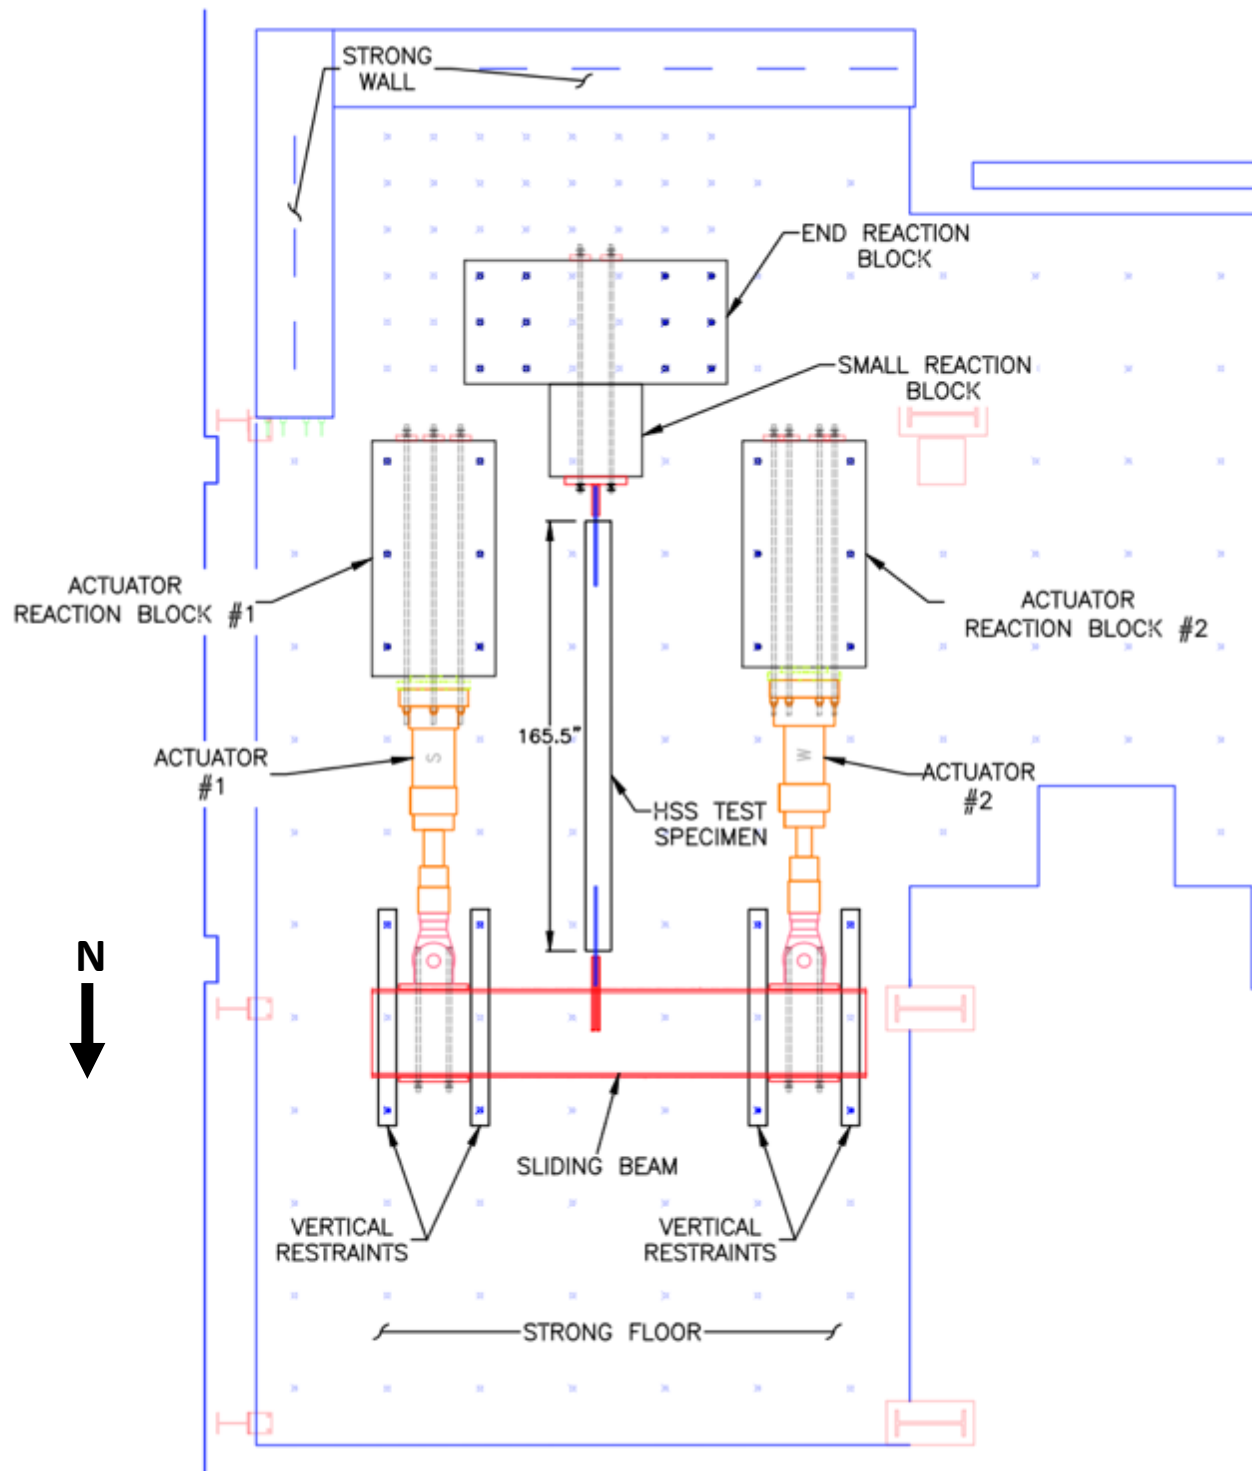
Overview of Test Frame for 165.5" Specimens
